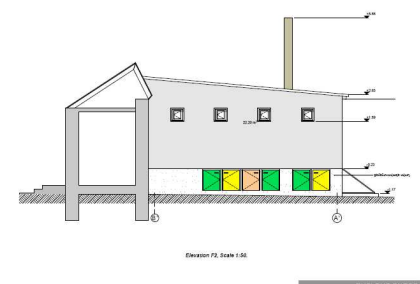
Elevation of the toilet facility, Design Quelque Chose (source AWHHE)
